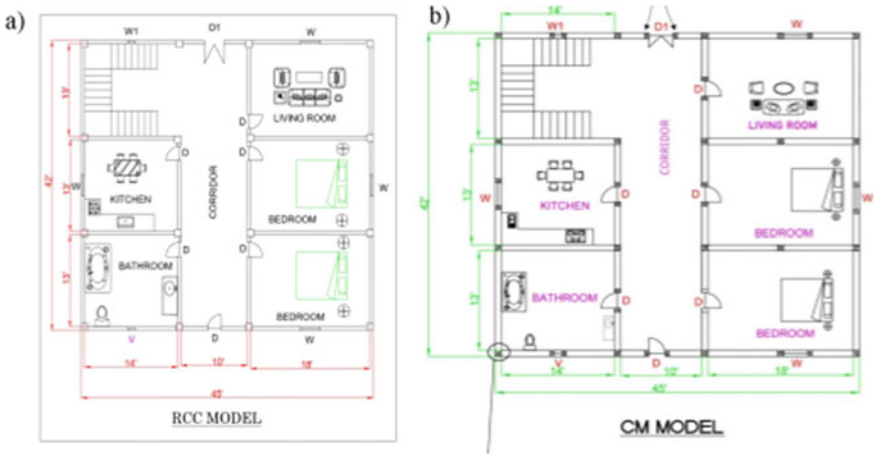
a RC Framed Building and b Equivalent CM building plan
